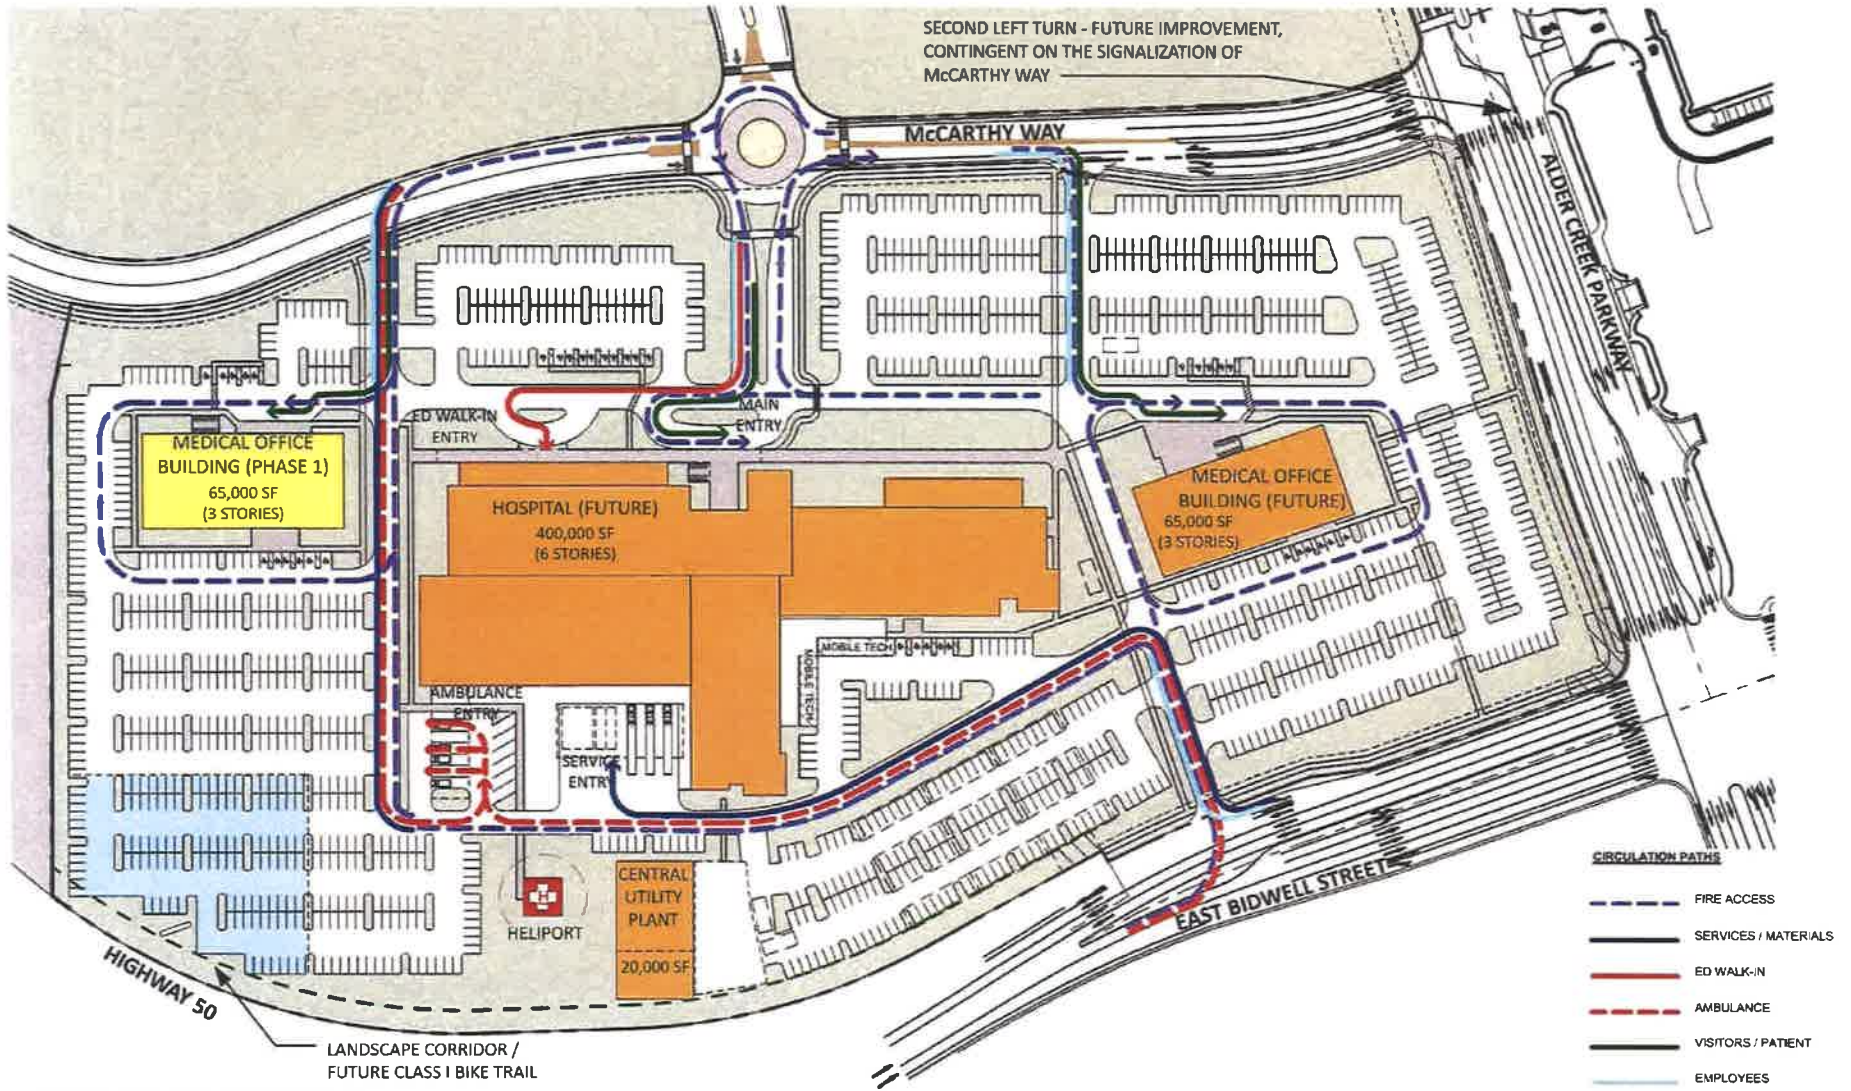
EXHIBIT D: SITE CIRCULATION FLOW PLAN
